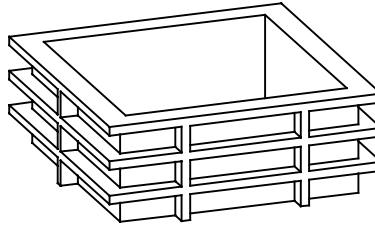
Tank with cross-ribbed horizontal and vertical stiffeners
